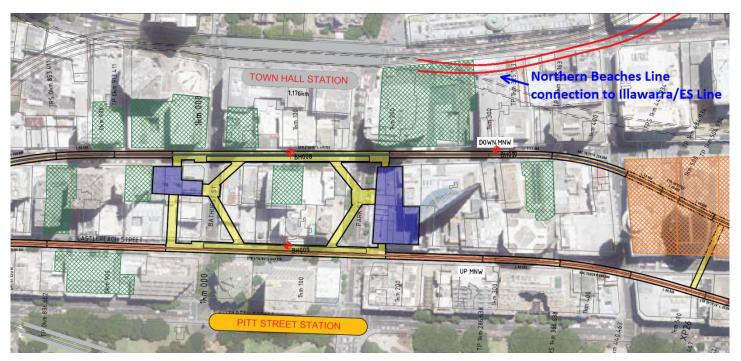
Proposed Northern Beaches line connection (red) to Illawarra/ES line at Town Hall superimposed on Sydney Metro EIS geological plan of Pitt St/Town Hall stations
